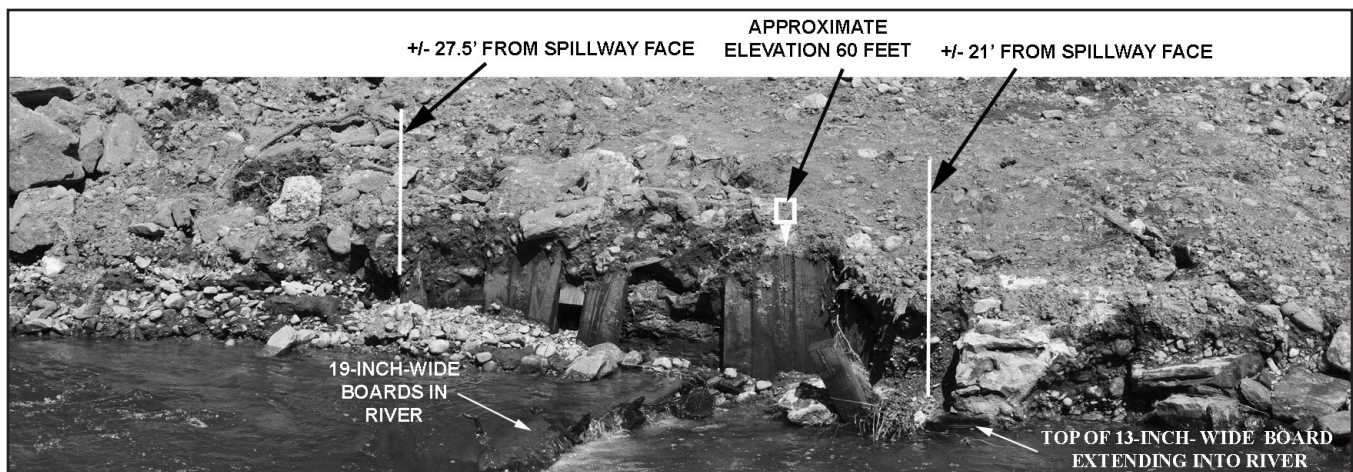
2018 view east of timber bulkhead exposed after dam demolition. Source: Alexis Cherichetti.
